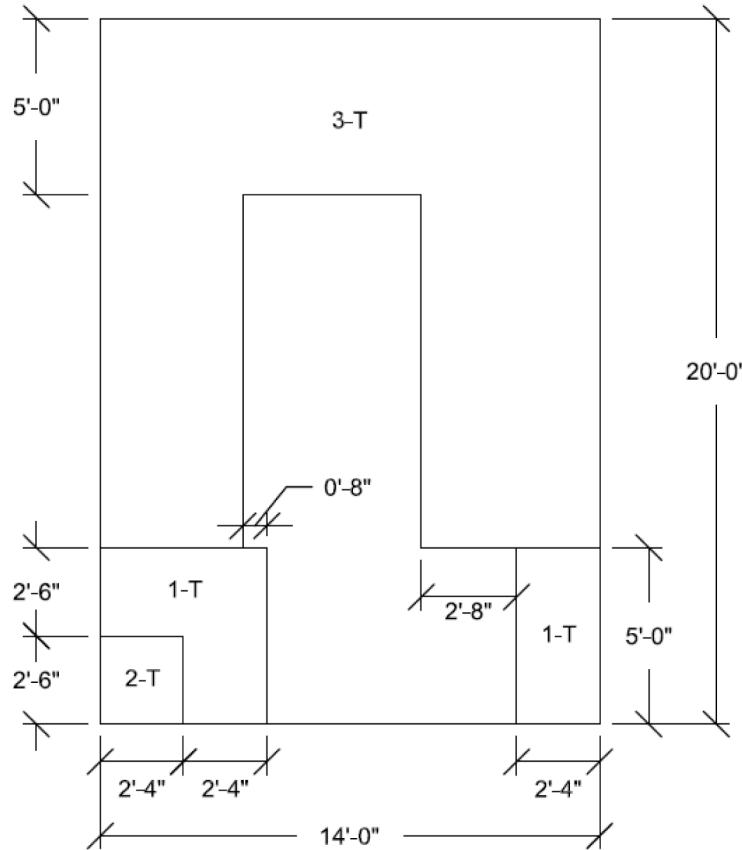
H.6-176B DGFOSV Wall 9 Looking From Outside Transverse Reinforcement Zone
